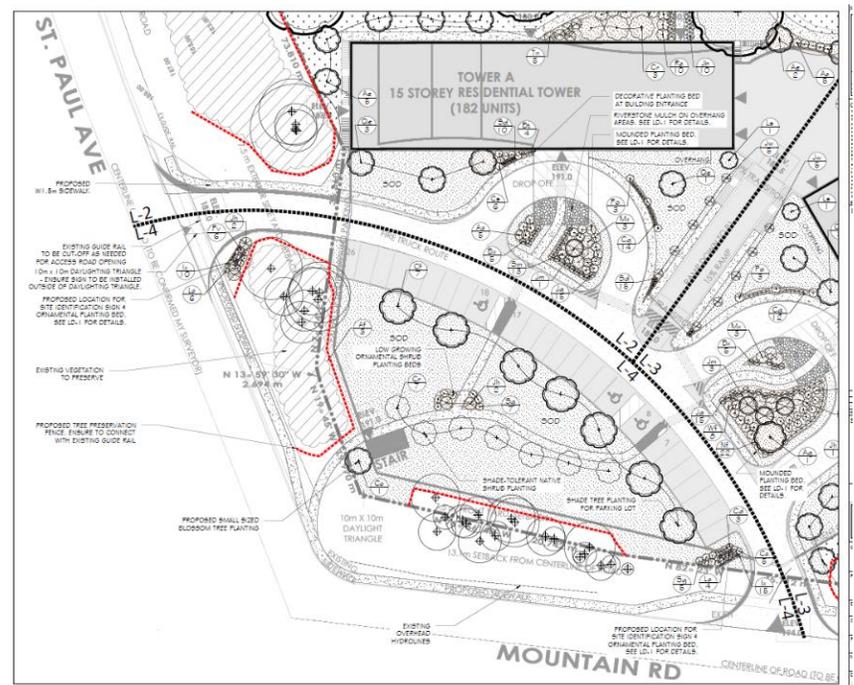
PARTIAL LANDSCAPE PLAN – FRONT
